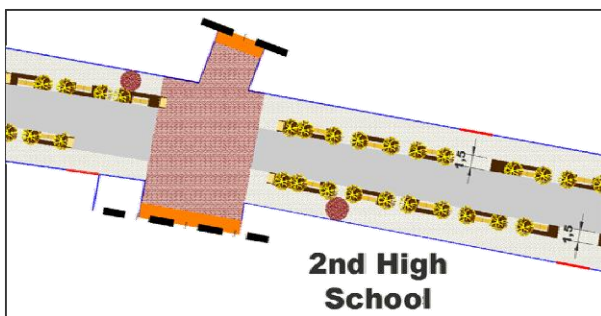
Street plan of the intersection at Fleming str. and the pedestrian access to school
